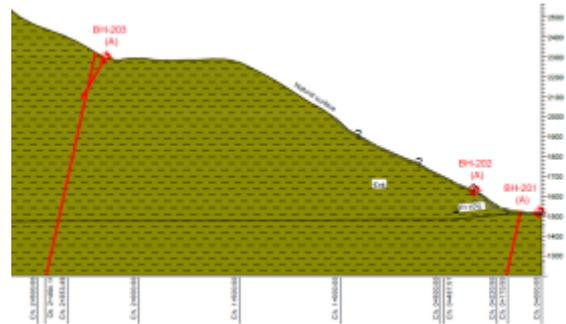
Section of the geological profile on former Transfer Tunnel alignment
